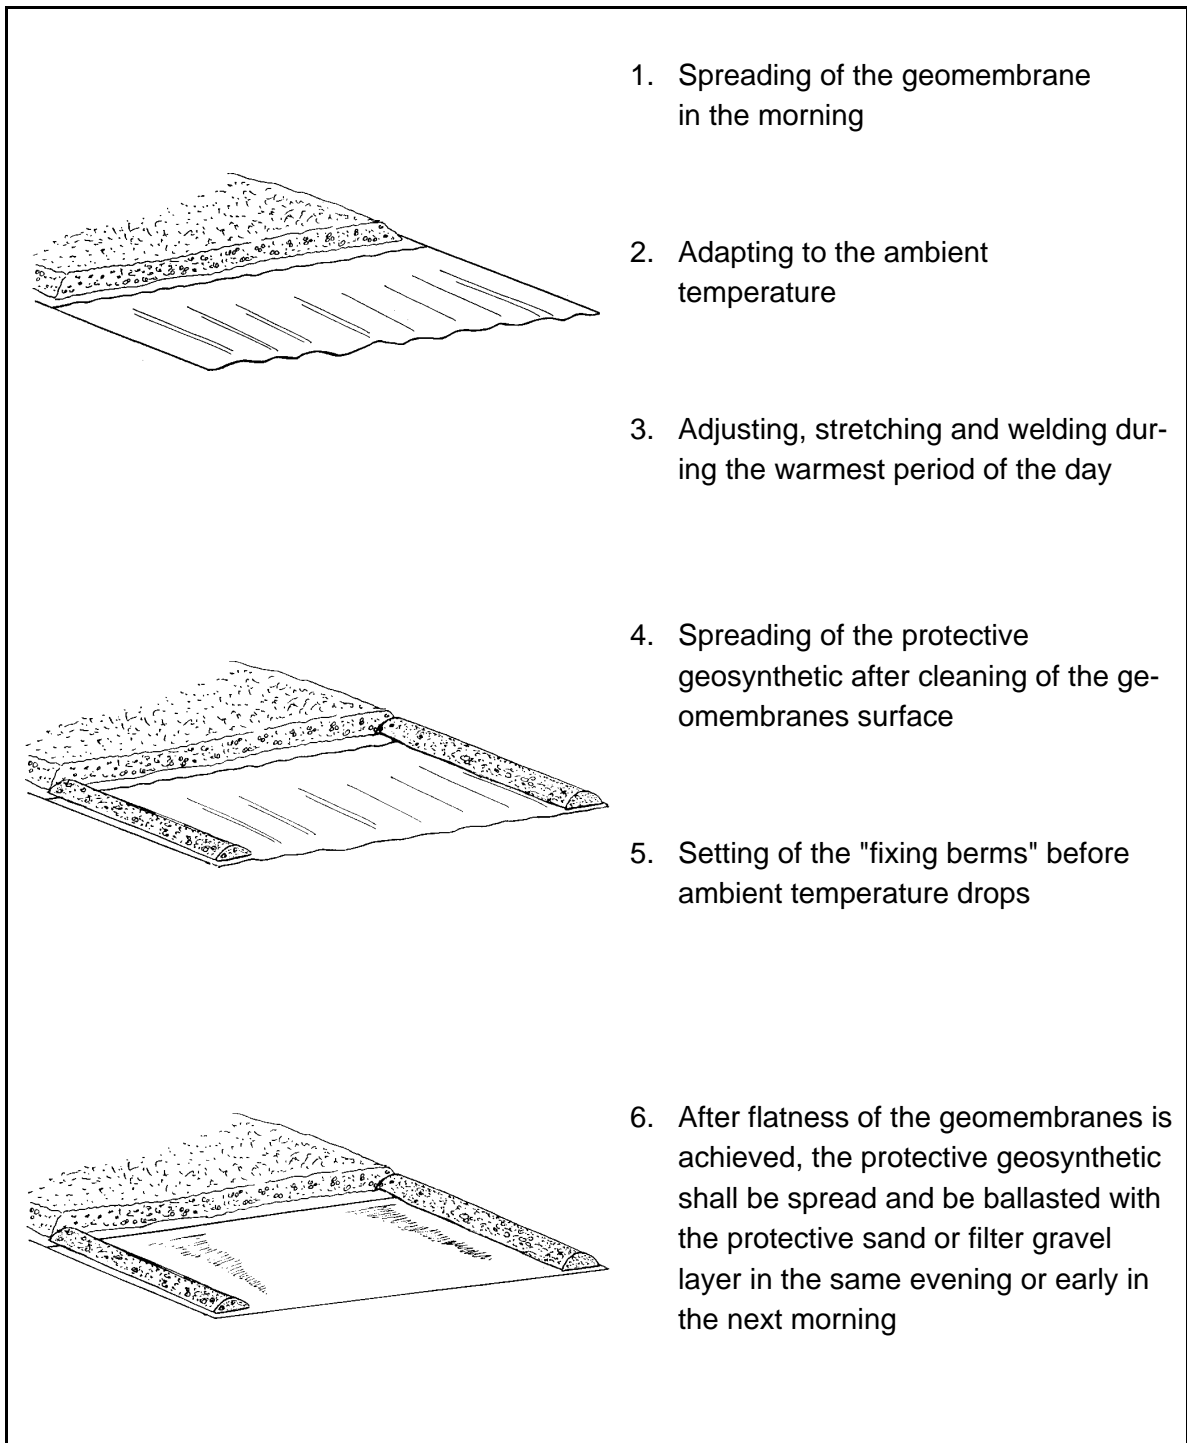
Scheme of flat placement of geomembrane by "Riegelbauweise" (Fixing Berm Construction Method).
